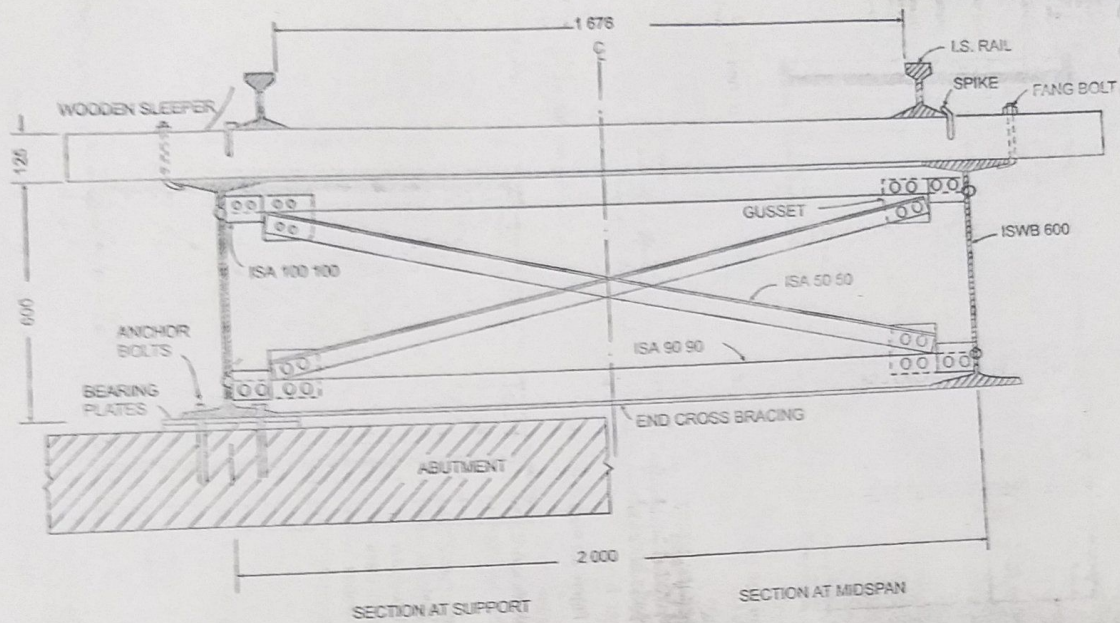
Cross Section of a Railway Culvert of Clear Span of 5.0 m.
